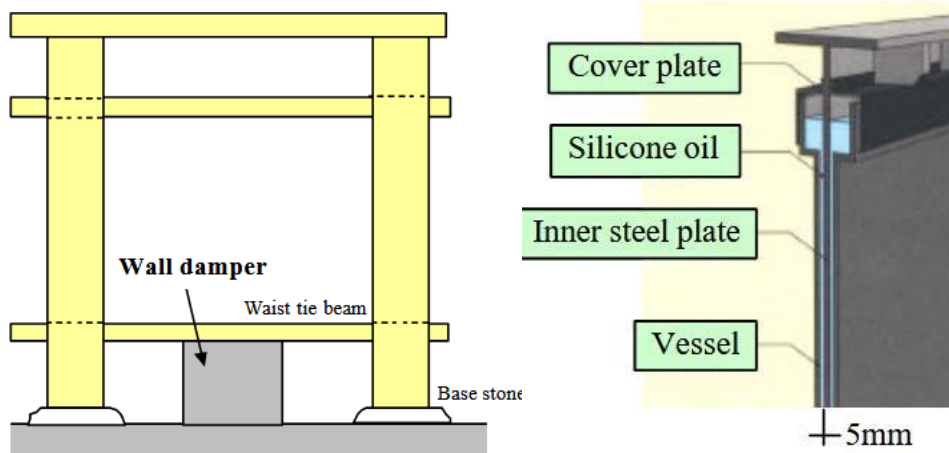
Installation of wall dampers (SUZUKI et al., 2001) [30]
